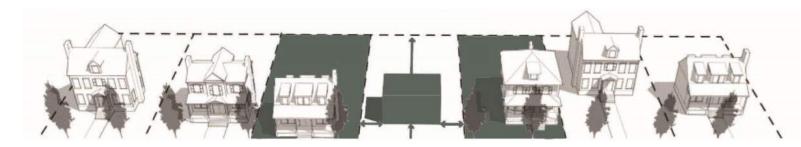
Orientation and setback of a relocated building should be in keeping with the surrounding buildings.
